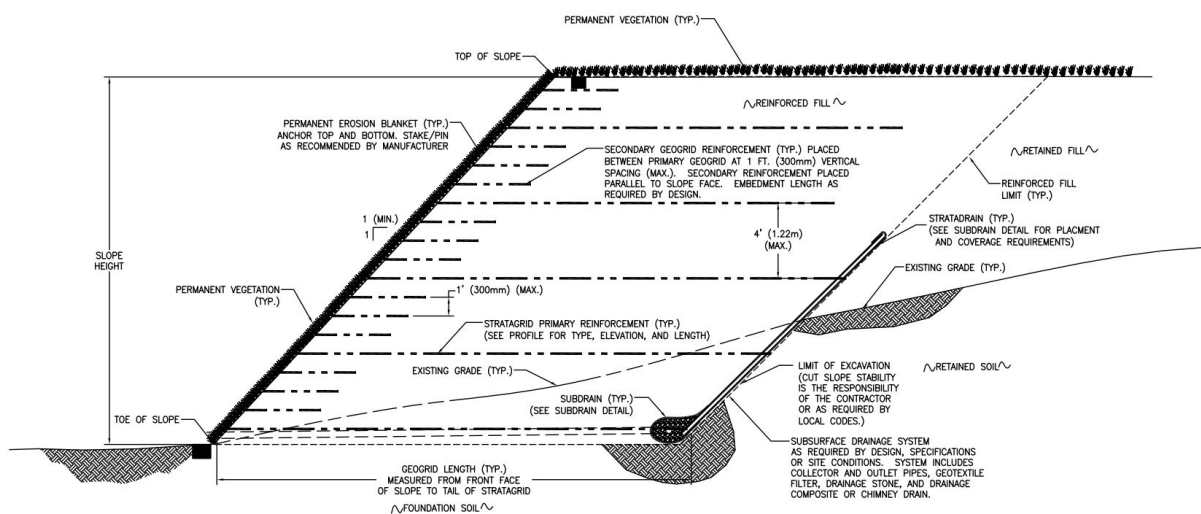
Reinforced soil slope – Typical cross section – 1:1 or flatter.
